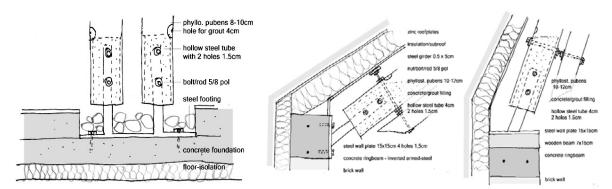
Schematic drawing of a column Figure 3.47. Schematic drawing of a connection to a ring beam. 2020.
